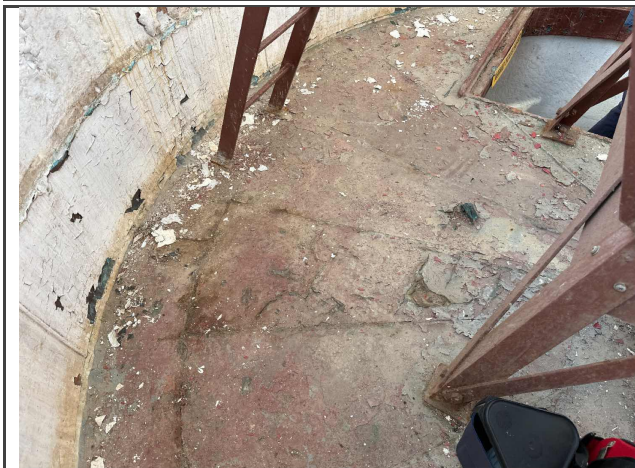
LOCATION: Internal, L2 Lantern room Copper sheeting to the floor
